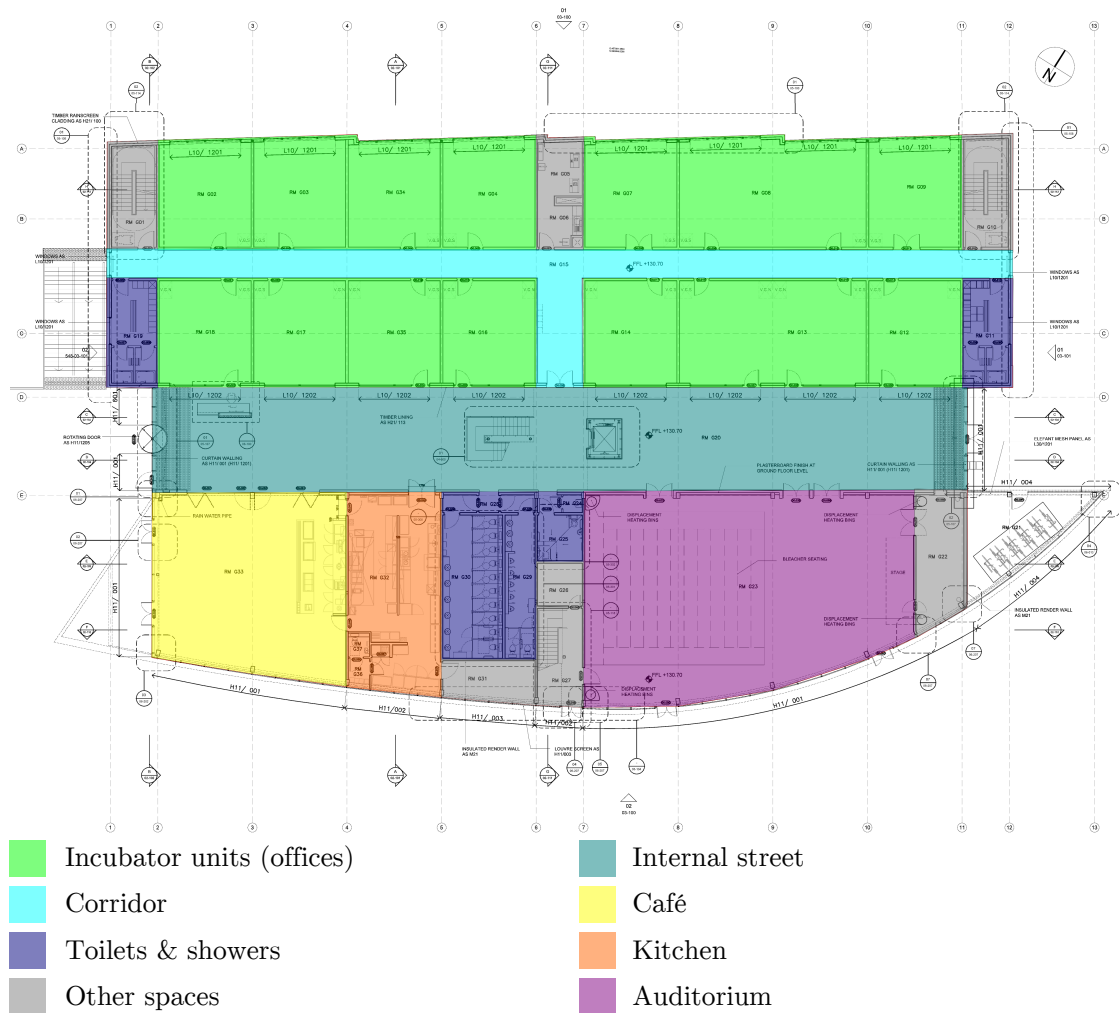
iCon internal layout (ground floor level) (adapted from [Consarc, 2011](#))
